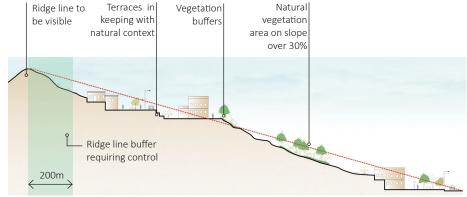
Sections showing ridge line zone. Plots adjacent to the ridge line are subject to additional scrutiny and must provide a 2 Point Study or LVIA
